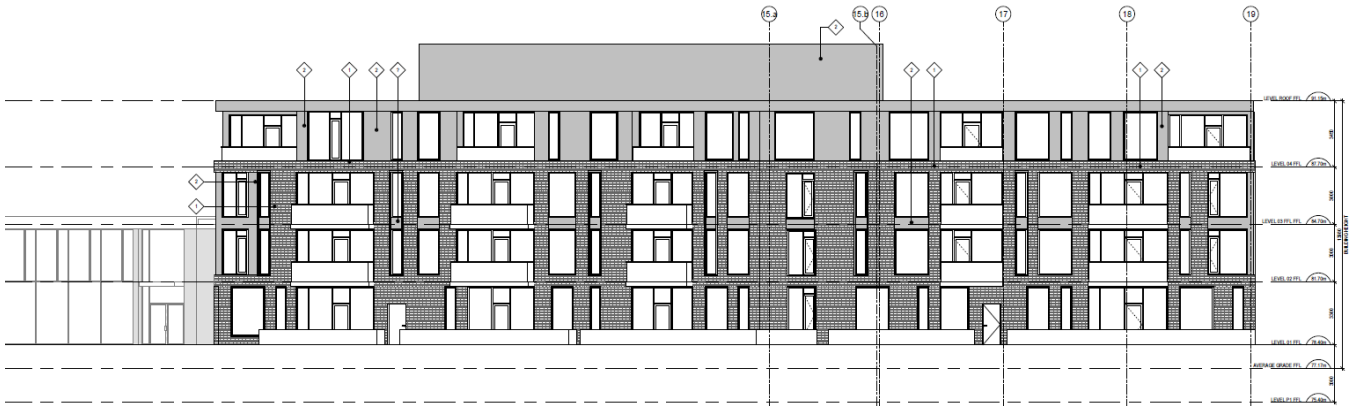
Excerpt from the South Elevation – East Wing drawing of the proposed development (as seen from March Road)
